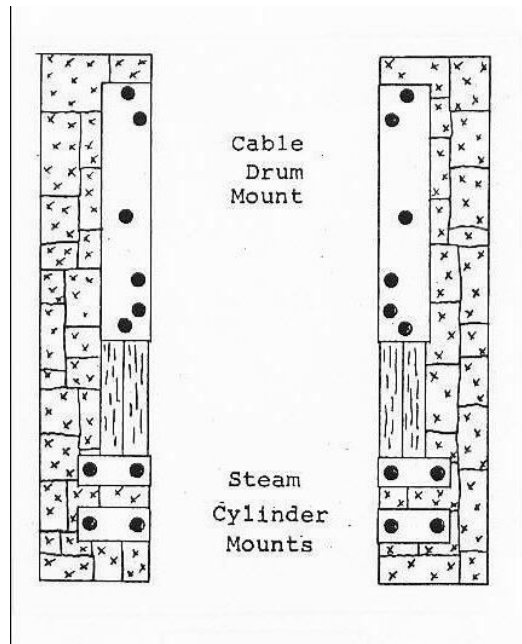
The plan view depicts a typical foundation for a direct-drive single-drum steam hoist. Such foundations are usually less than 14 by 17 feet in area. Source: Twitty, 2002:241.
